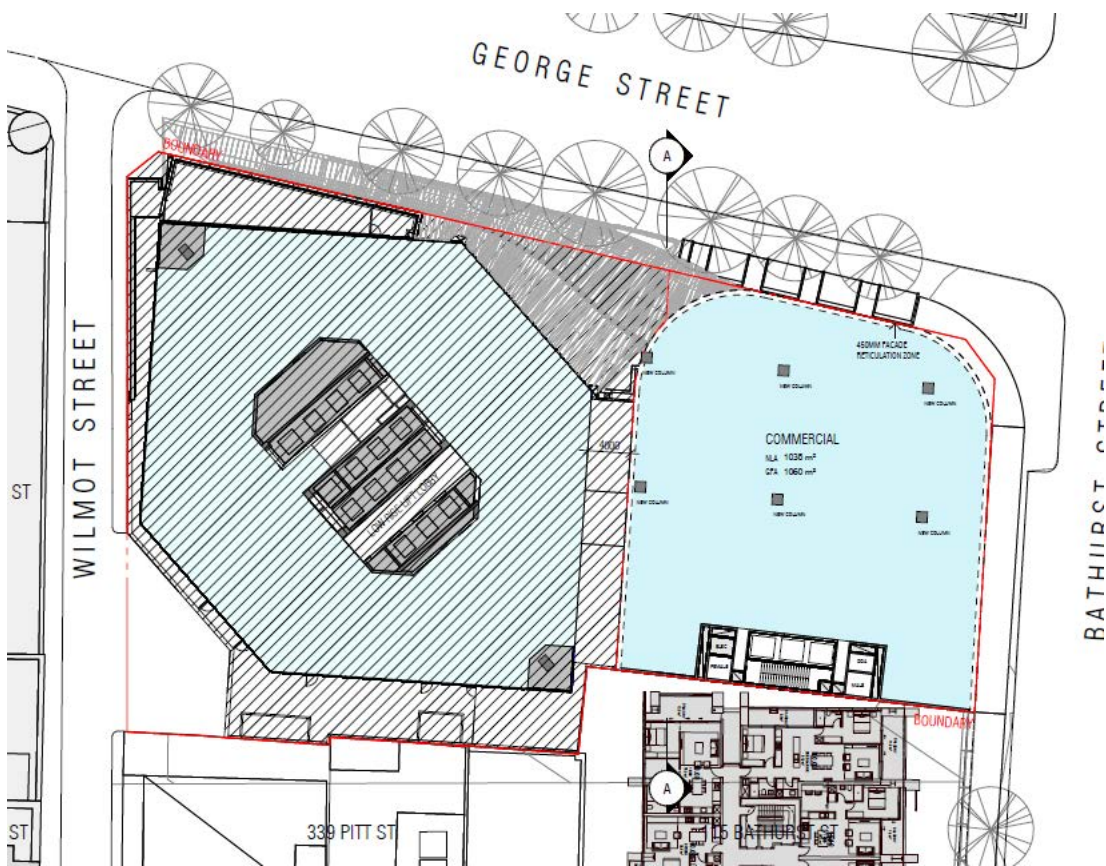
Extract of proposed plans showing proposed Typical Upper Podium.
